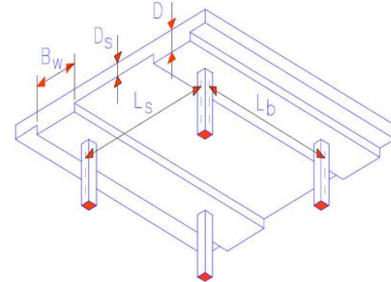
One Way slabs supported on two parallel band beams. (Source <http://www.vhptsystem.com>)
